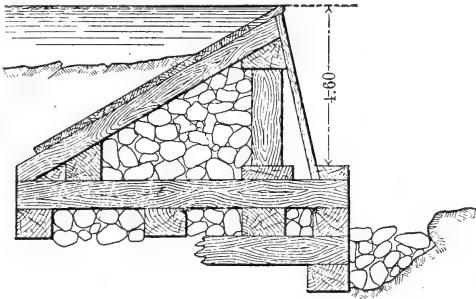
Cross-section of dam on Chittenango creek at Bridgeport
